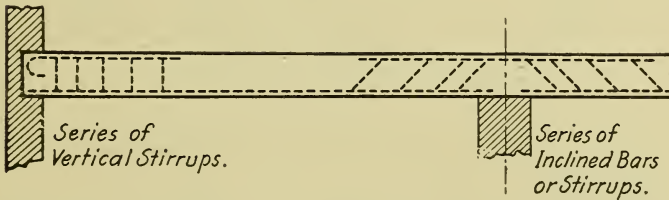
Typical Reinforced Concrete Beam; Web Reinforced by Means of Series of Vertical Stirrups or Series of Inclined Bars or Stirrups.
